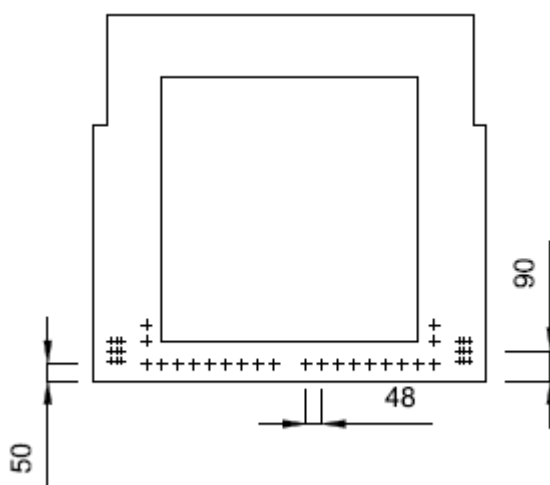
, Prestressing at mid cross-section A - dimensions in [mm]
